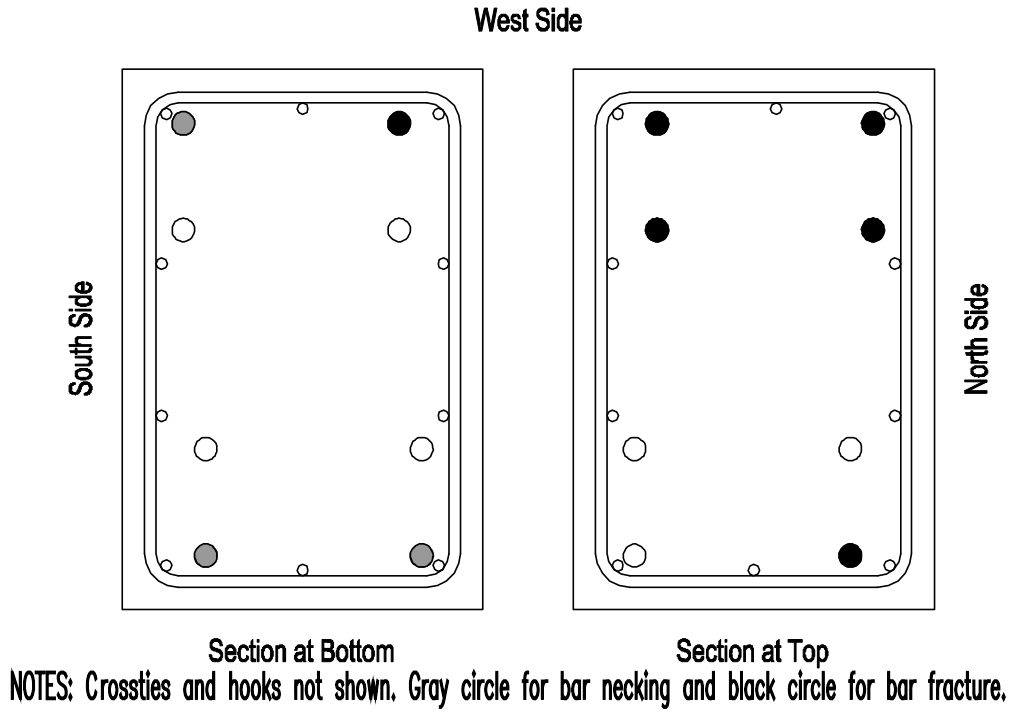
Reinforcing bar fracture locations, D120-1.5
